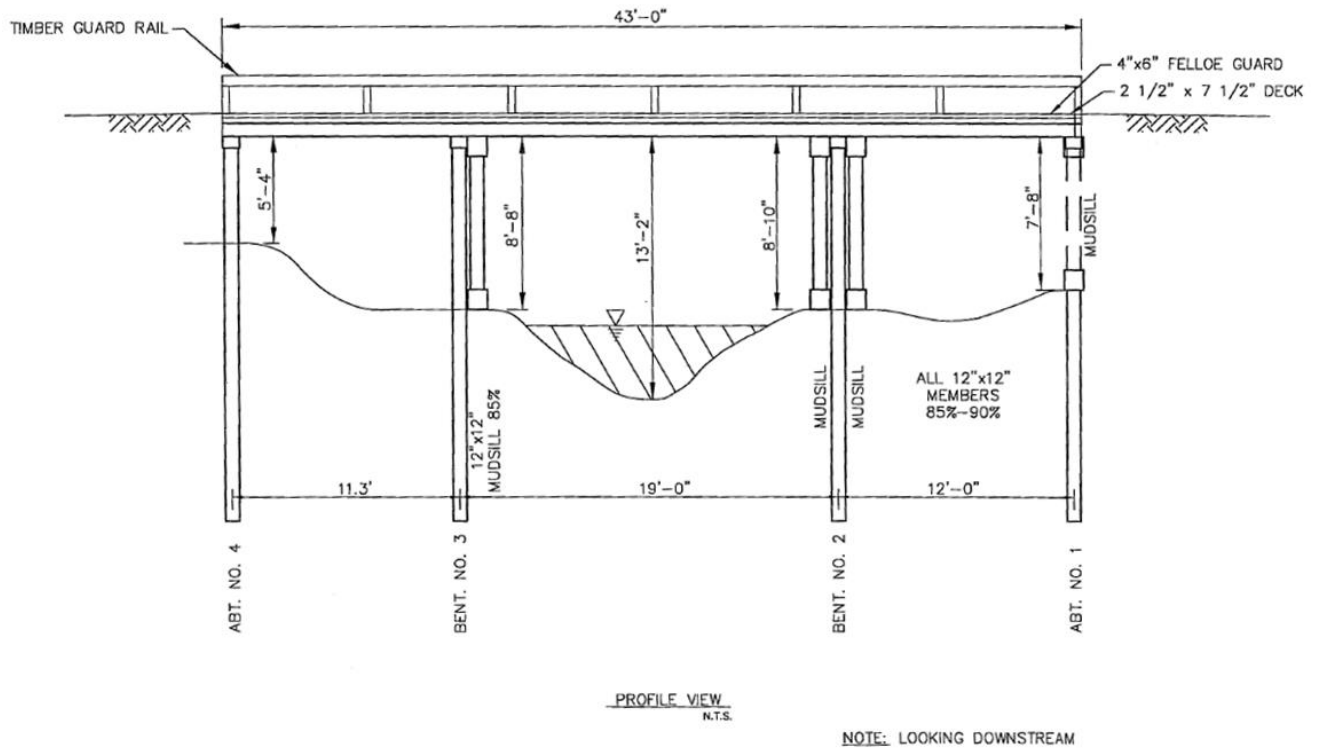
EXISTING CENTRAL STREET BRIDGE DRAWING
